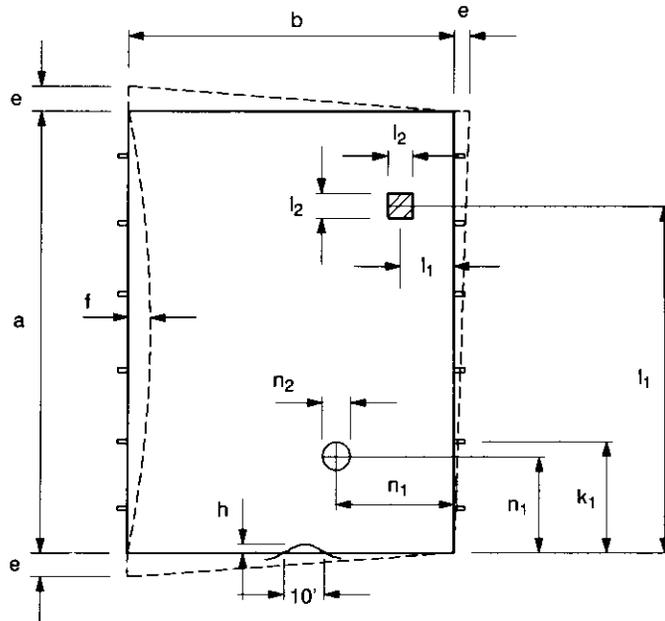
Prestressed Concrete Panels for Storage Tanks
